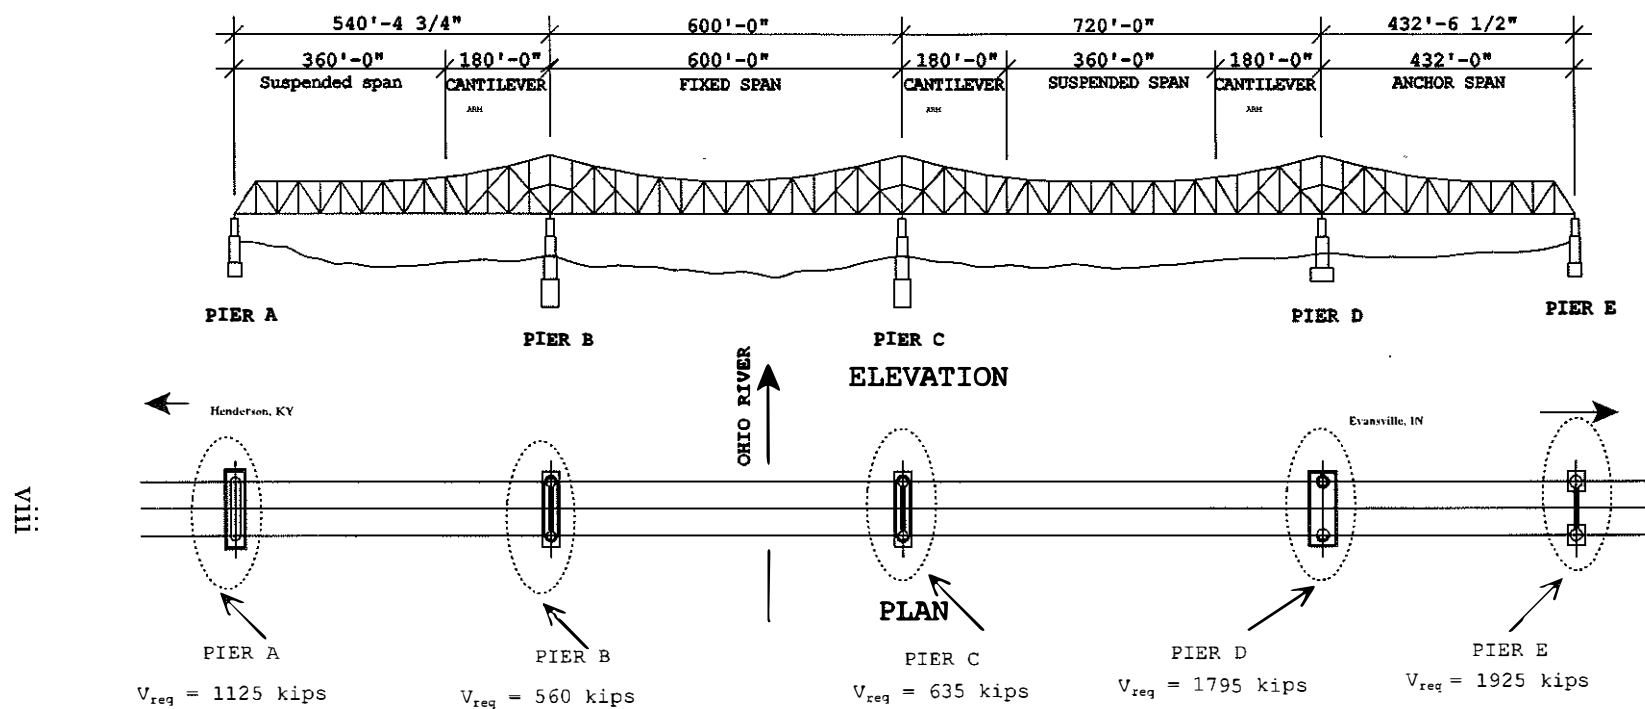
Minimum Required Shear Capacity ( $V_{req}$ ) to be Provided by Additional Anchor Bolts at Bridge Piers for the US 41 Southbound Main Bridge
